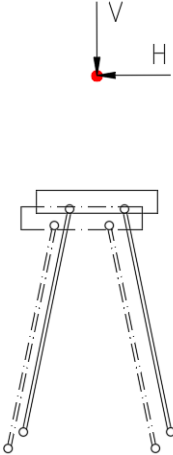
External forces acting on the pile center, highlighted in red, cause only translations and no rotations.
